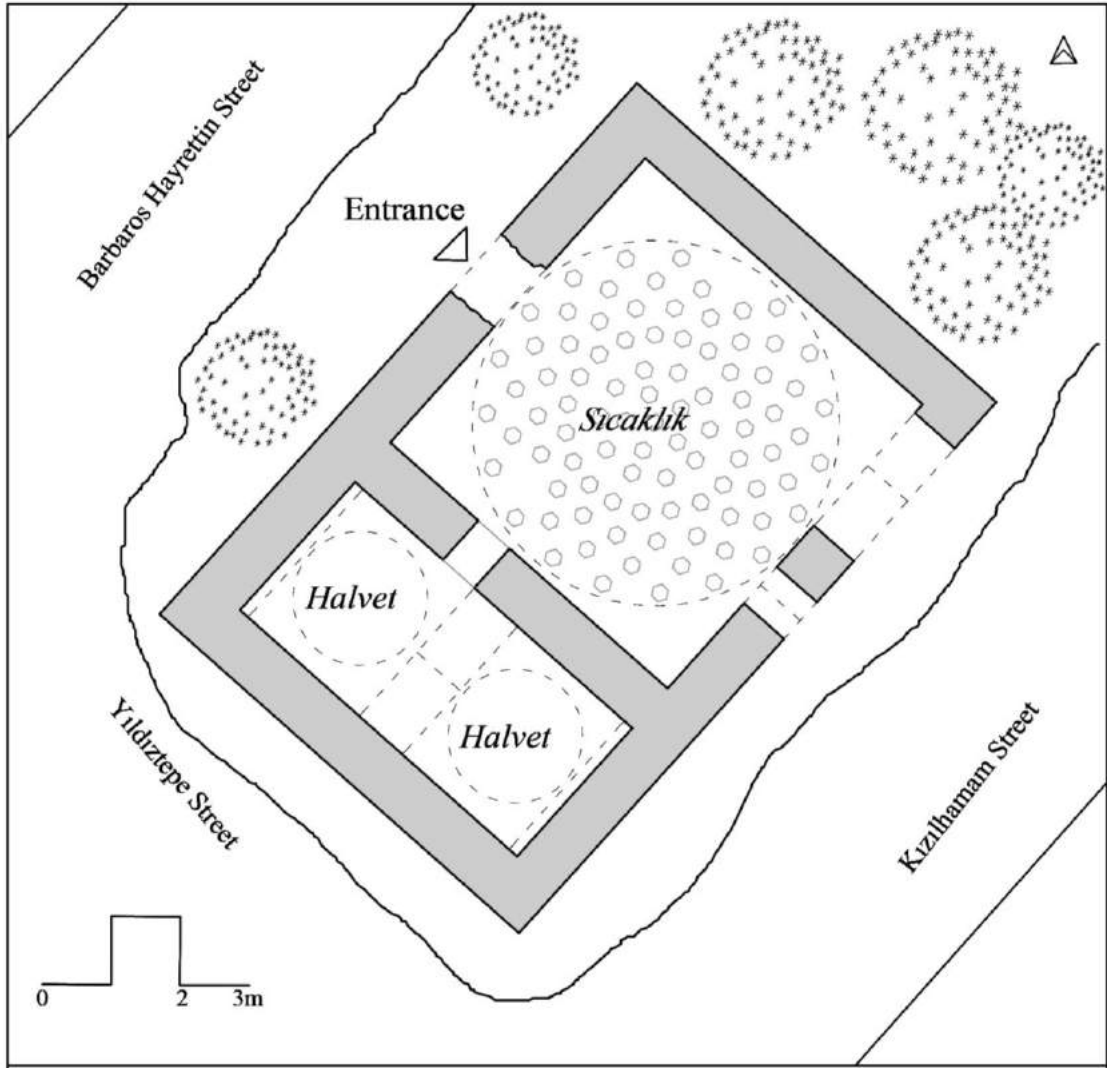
Ground floor plan, Rüstem Paşa Bath first construction
